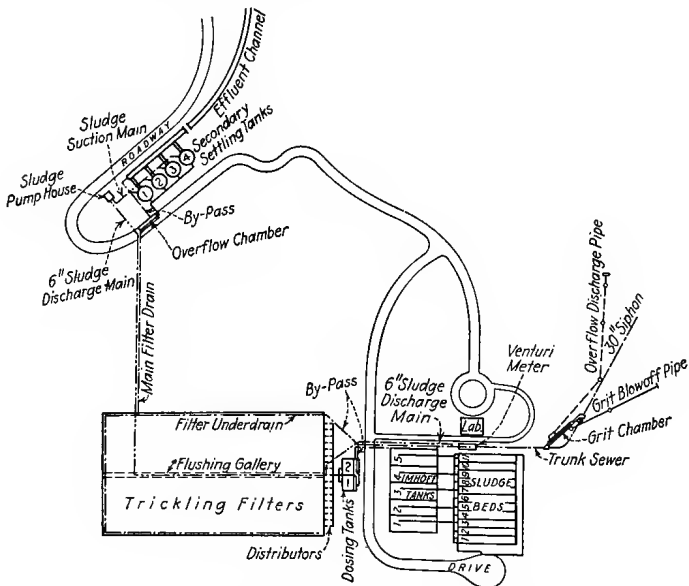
Trickling-filter plant at Fitchburg, Mass.
